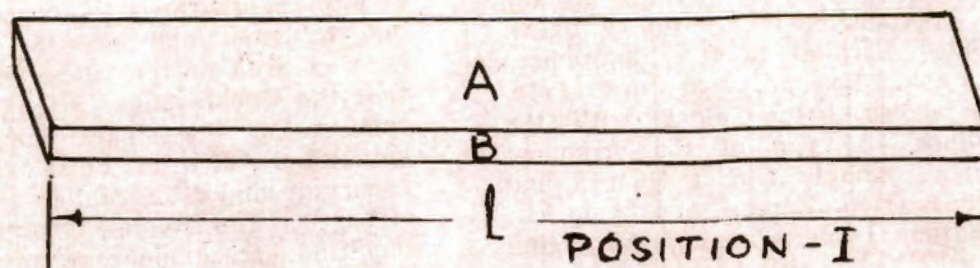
FIG. V SPECIMEN FOR DEFLECTION TEST OF WOODEN BEAMS
